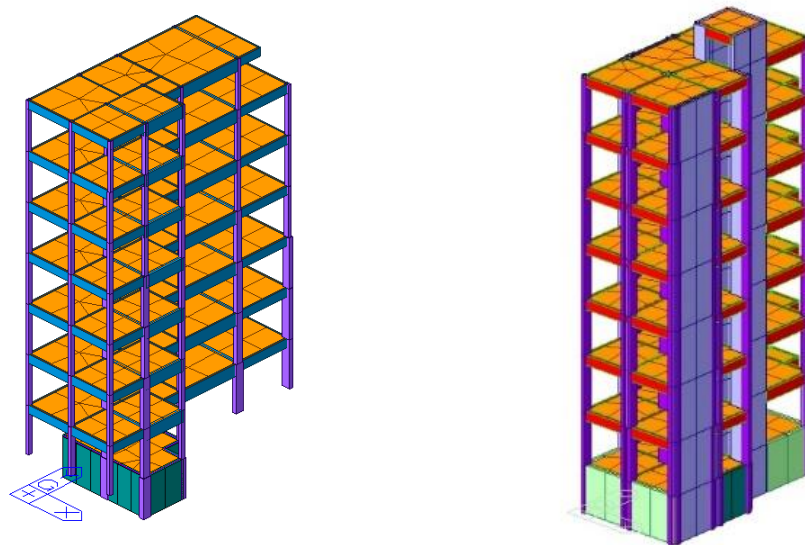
3-D finite element models for the pre- (left) and post-strengthened (right) states of the building
